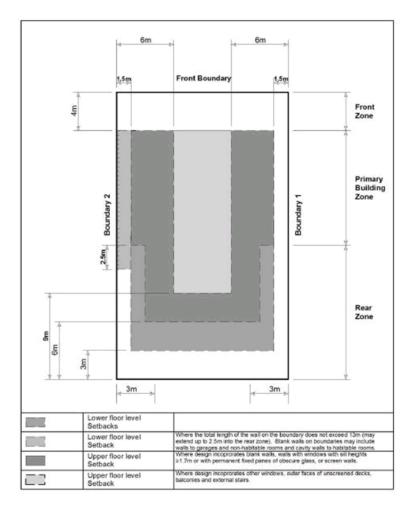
Typical building envelope for rule R8 - Mid sized blocks approved before 5 July 2013 & permissible encroachment under R9 Note: height of building and bordary setback provisions also apply Hatched area indicates permissible encroachment under R9.
